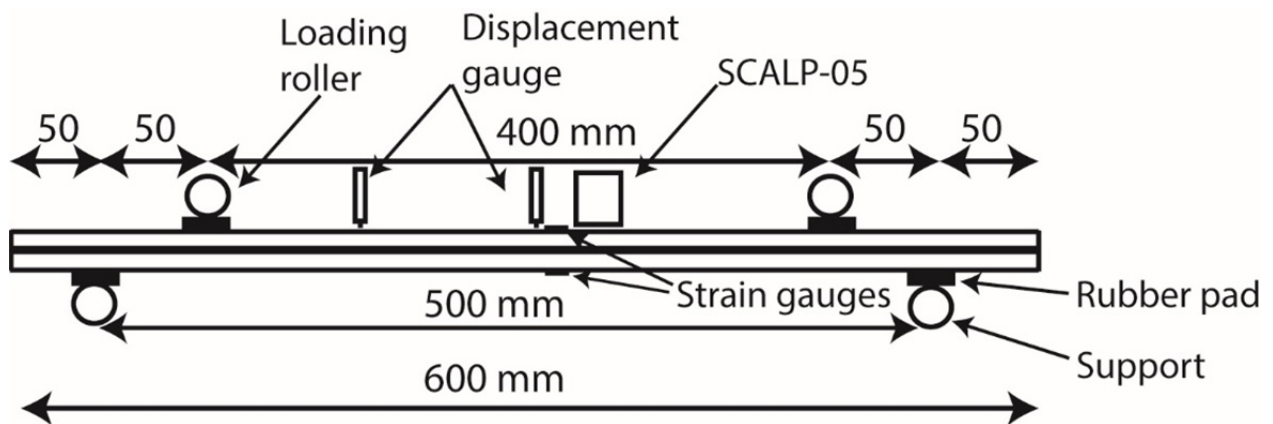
Test setup configuration (All dimensions are in millimetres).
